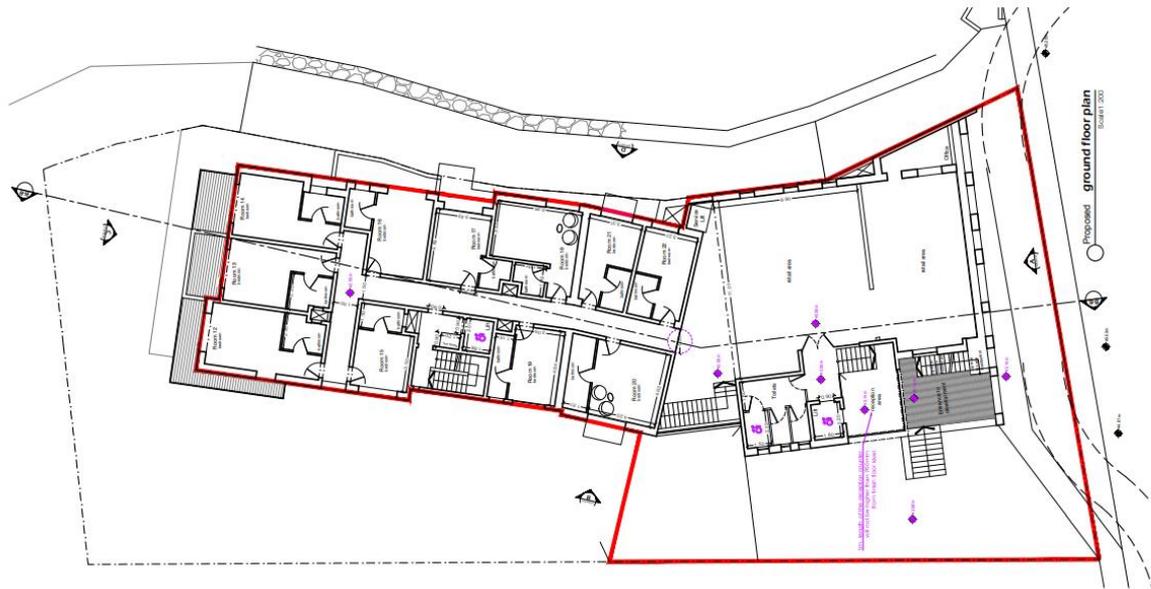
Ground floor (Source: E- apps doc PA9046/18/133d)
